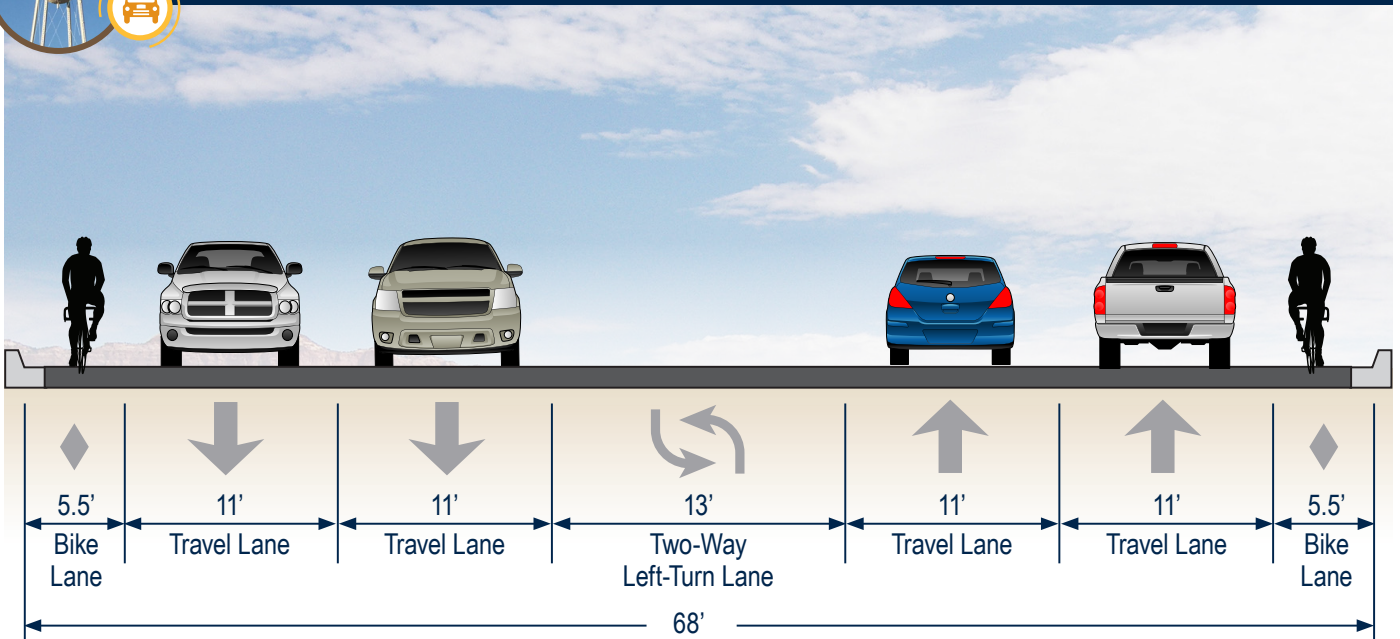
Existing and Proposed Cross-Sections for Gilbert Road: Bruce Avenue to Silver Creek Road
